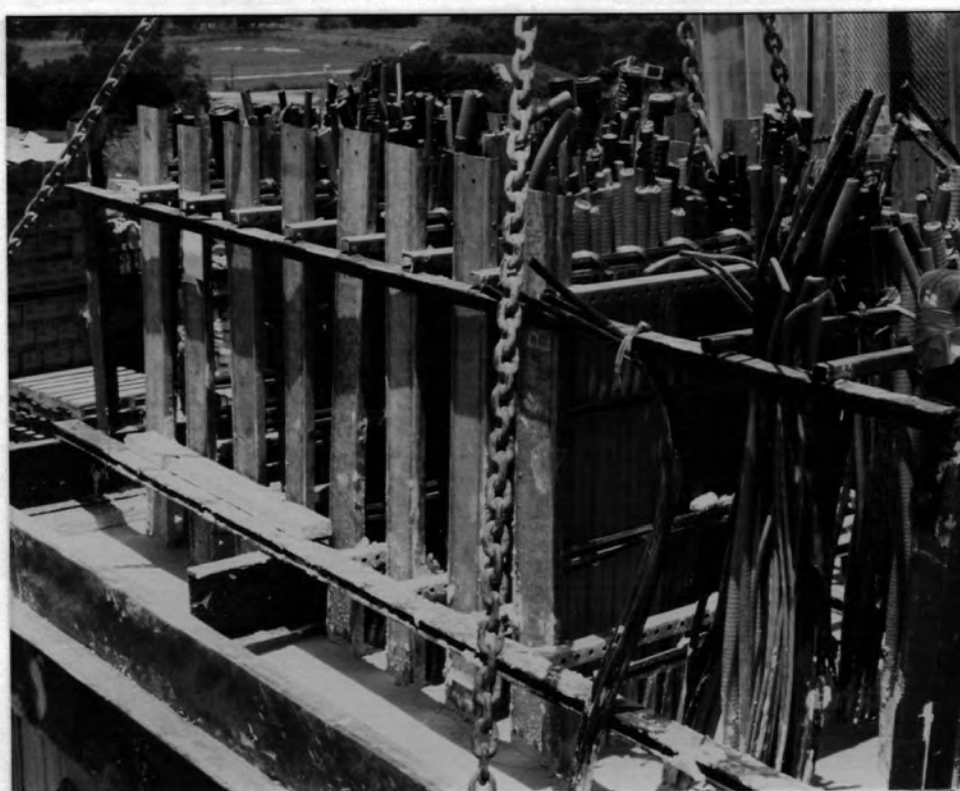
OVERALL VIEW OF TEST SLAB PLACED ONTO FURNACE
